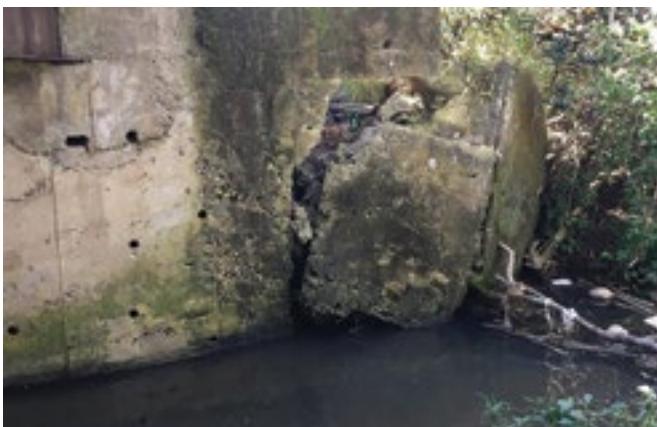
Upstream partial wingwall collapsed Bridge No. 141, Cabo Rojo, PR
